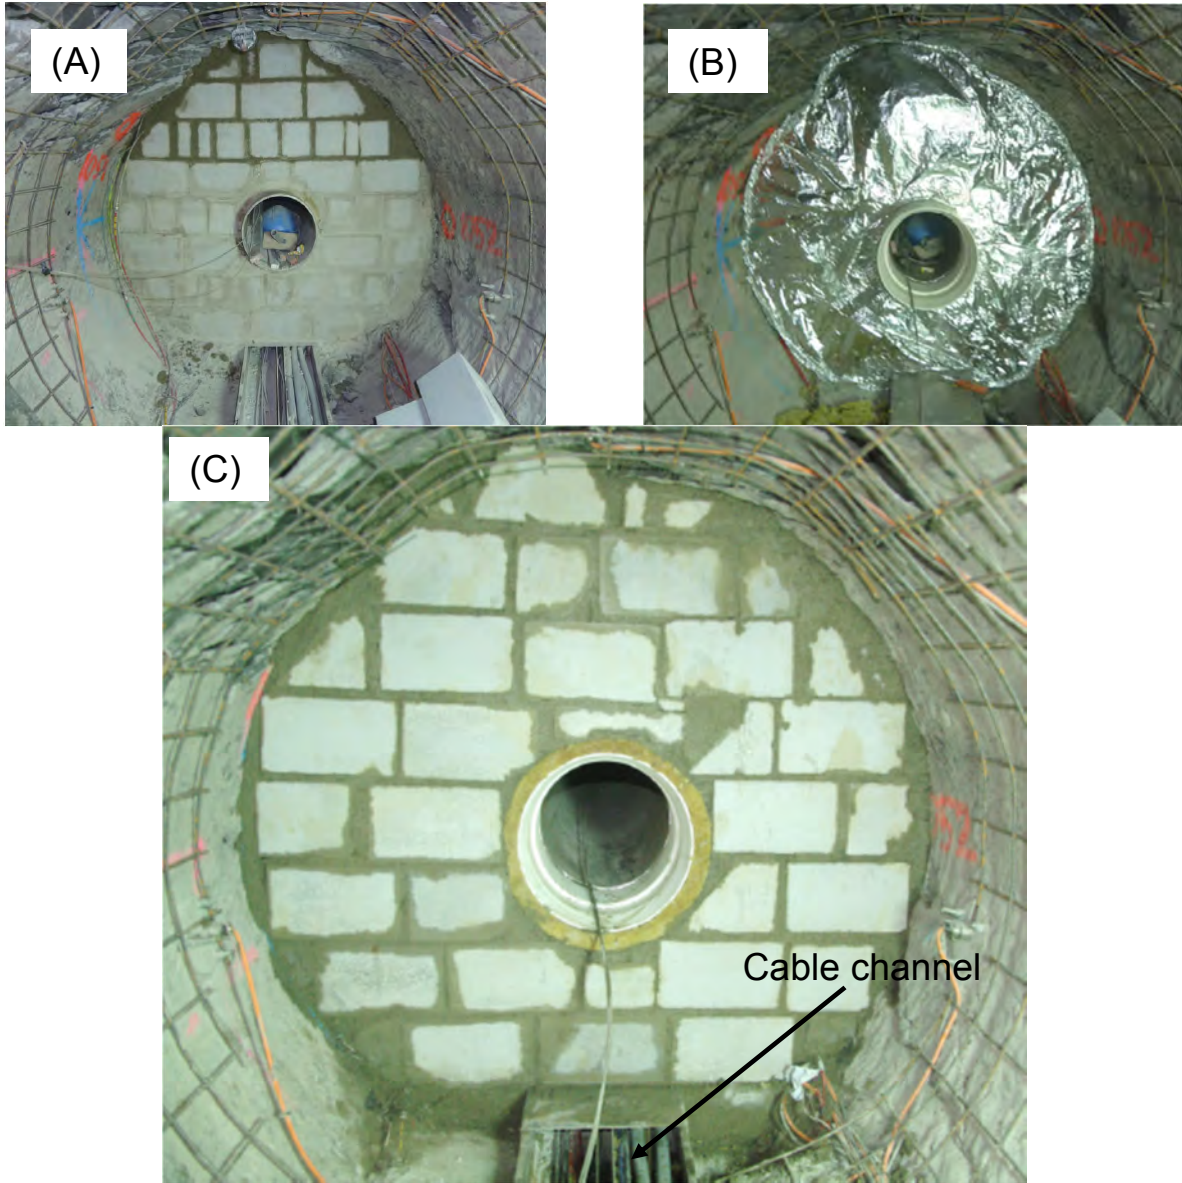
Photographs Illustrating Stages in Construction of Plug 2: (A) Construction of the First Wall; (B) Construction of the Isolation System and Vapor Barrier; (C) Construction of the Second Wall (Teodori and Gaus, 2011)
